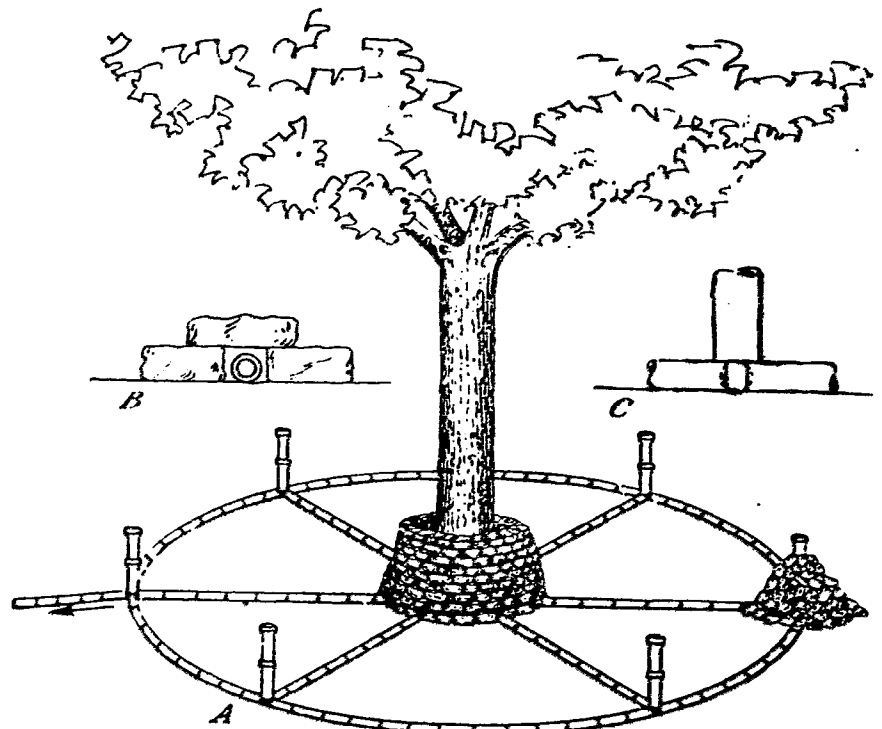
Preliminary steps in constructing a fill: Dry well around tree trunk to permit air and water circulation. Tiles on ground sloped so as to drain away from trunk and off roots, as indicated by arrow. A, Vertical bell tiles connected with drain will permit additional air circulation; one on extreme right is held erect by loose stones. B, Protecting arch of stones placed over drain tiles to prevent breakage. C, Vertical tile resting on ends of horizontal tiles that are spaced to allow circulation.
